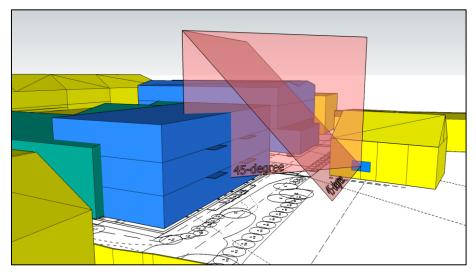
3D Model – 128 Jubilee Drive (45-degree plane in plan & elevation)
